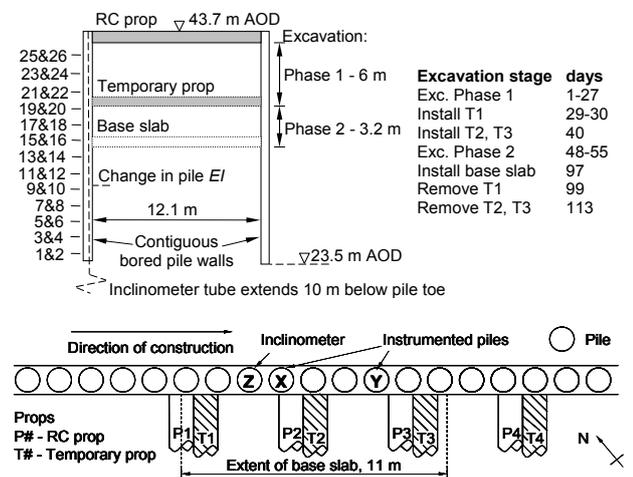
Elevation and plan showing construction sequence and pile and prop locations
